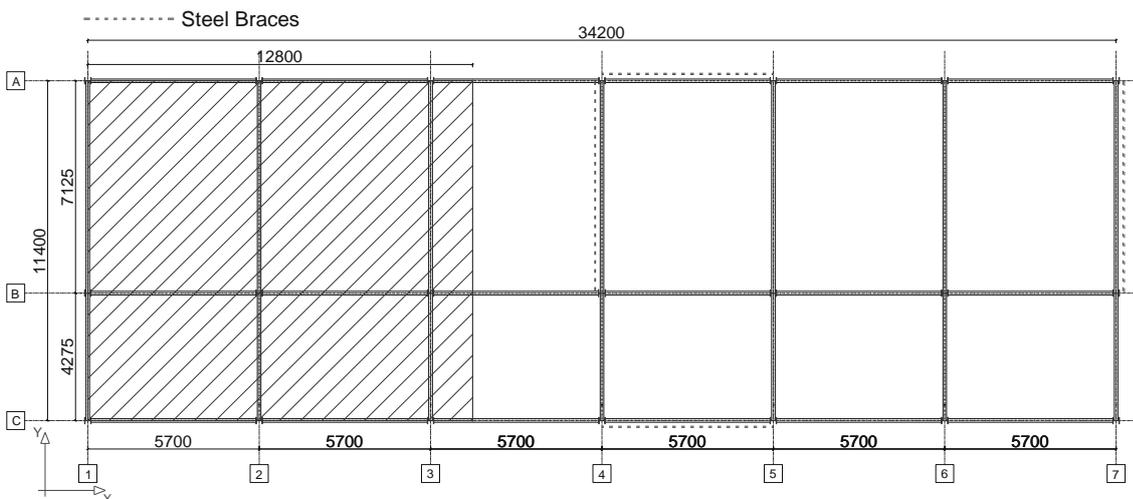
Floor Framing Plan - Asymmetric Configuration (dimensions in mm)
